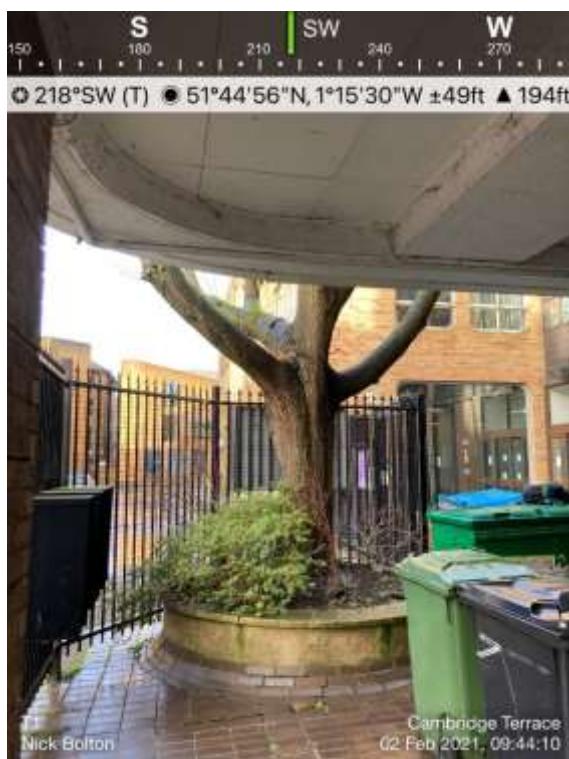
New wall will be suspended from the roof of the existing cycle store and will not affect the tree
